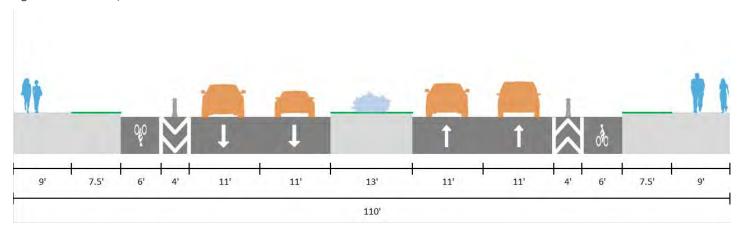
Collector, 4 Lane Section with On-Street Bike Lane
